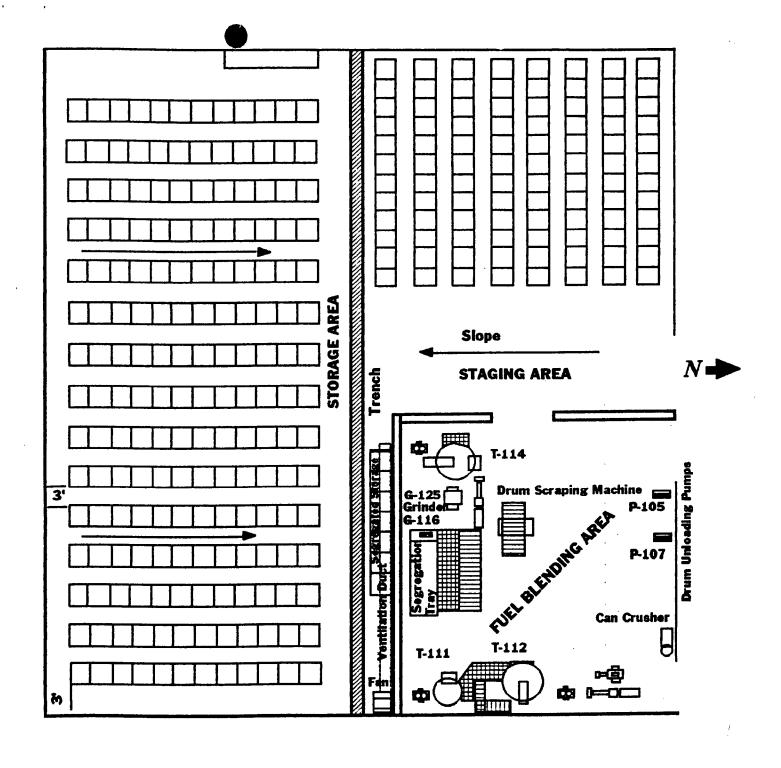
Arrangement of Pallets within the Drum Storage Building
